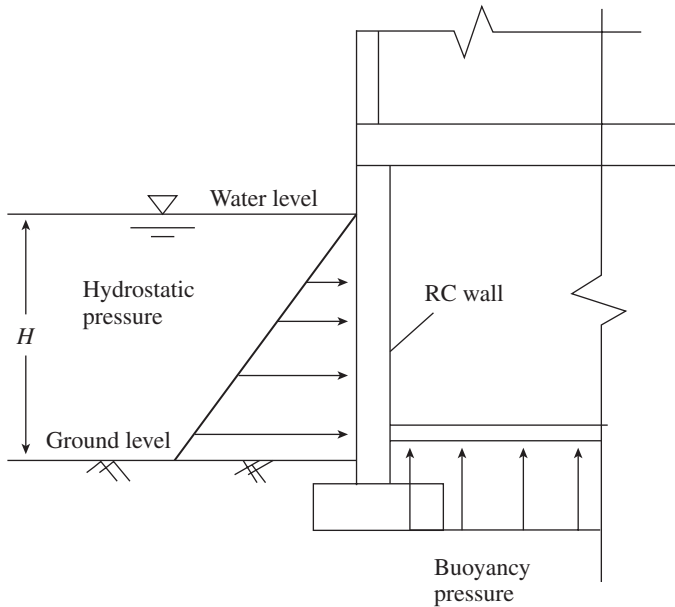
Soil or hydrostatic pressure on retaining wall
